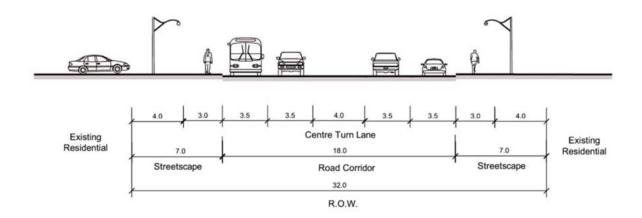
THE QUEENSWAY, KSP EXISTING CROSS-SECTION (RAVENSHOE ROAD TO PINE BEACH DRIVE)
